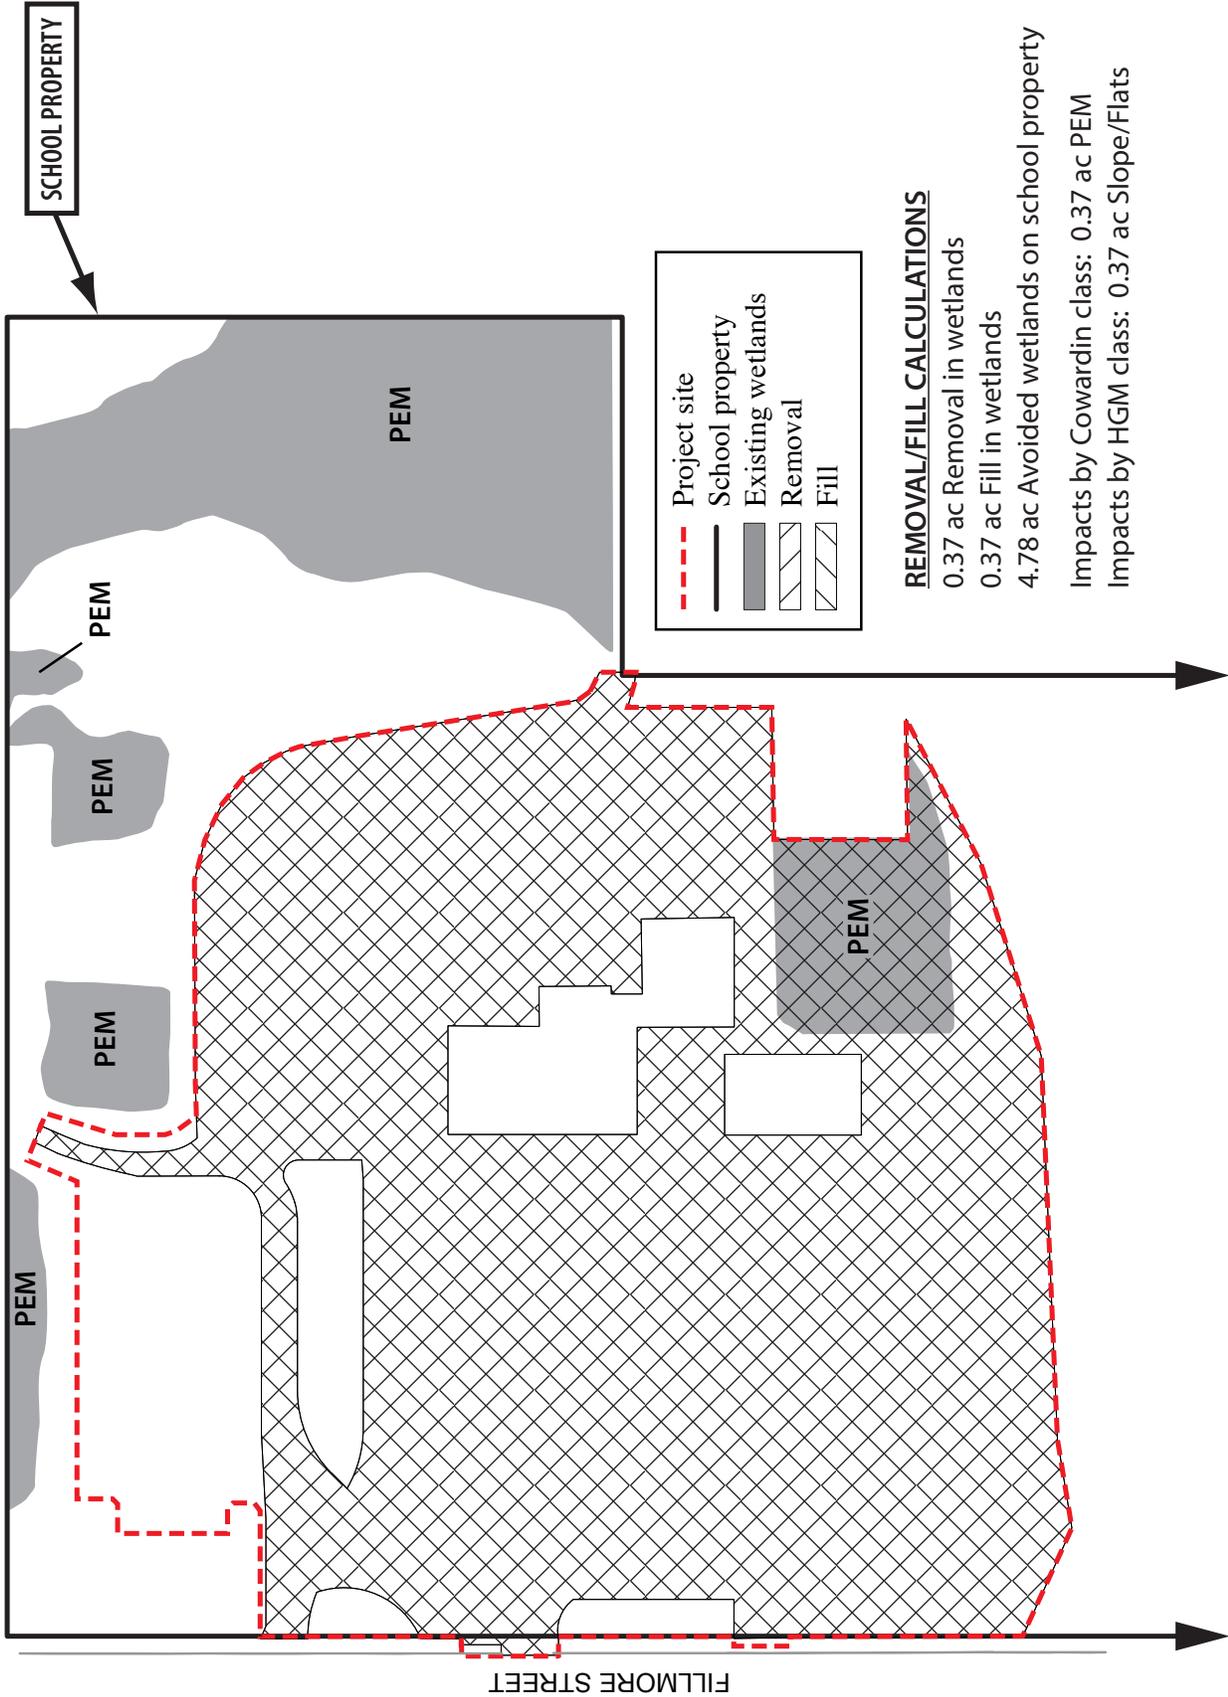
SITE PLAN SHOWING REMOVAL AND FILL
